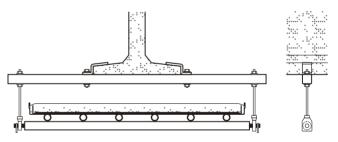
Example of brackets with roller for panels parallel to roof tiles
